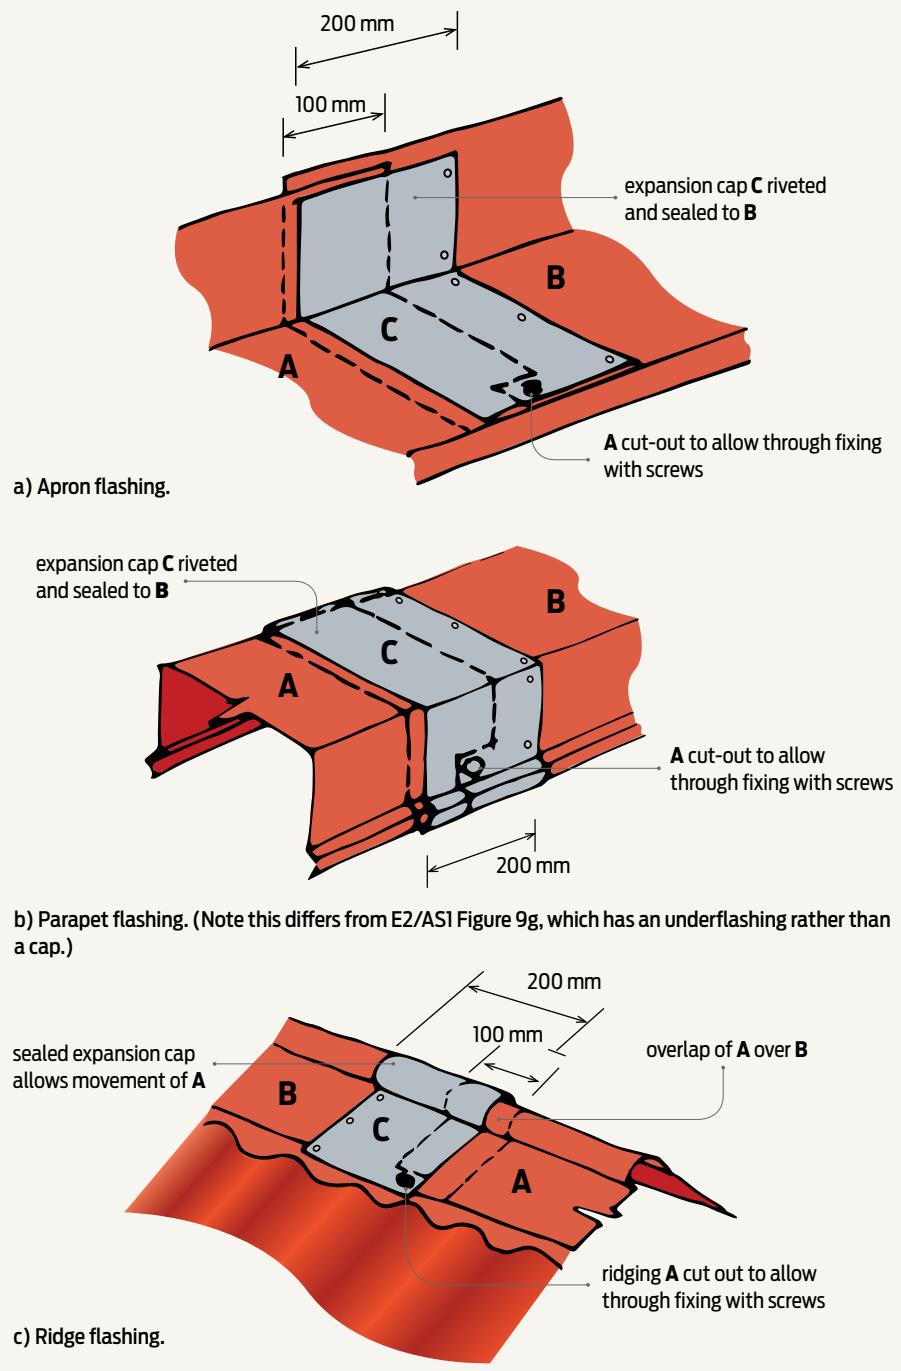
Expansion joints to allow thermal movement (from *NZ Metal Roof and Wall Cladding Code of Practice*).
